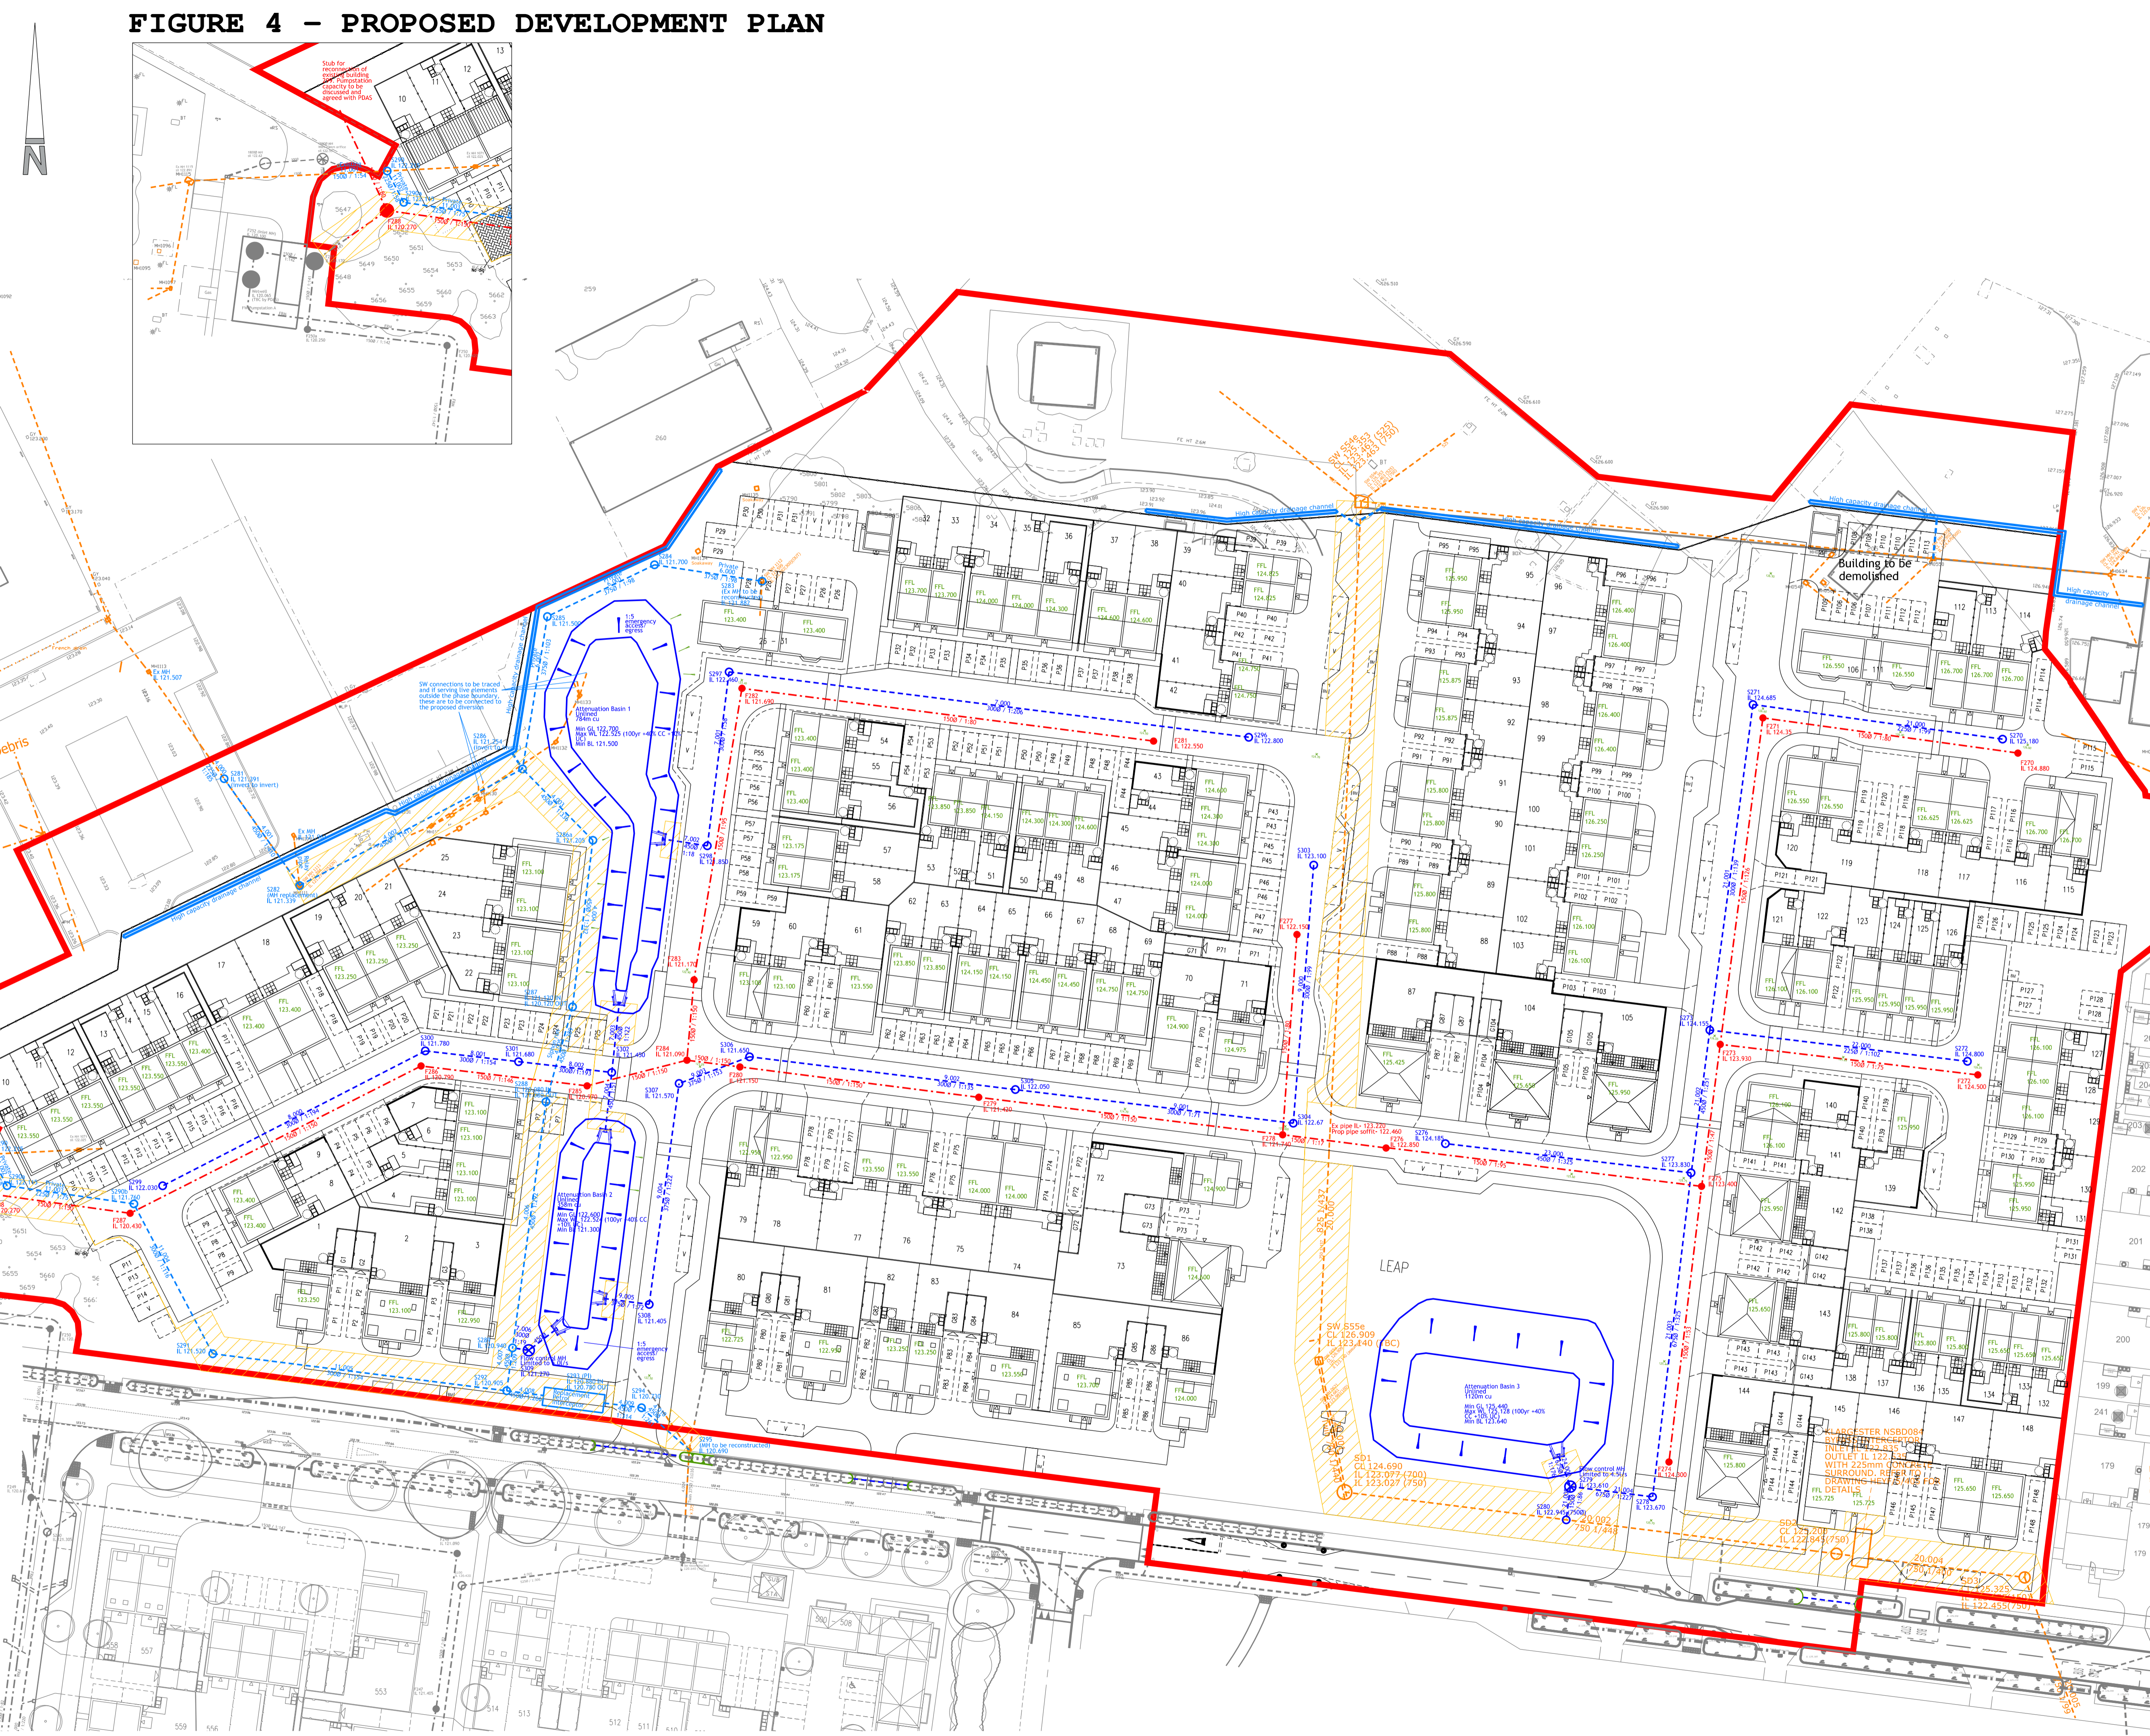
PROPOSED DEVELOPMENT PLAN
